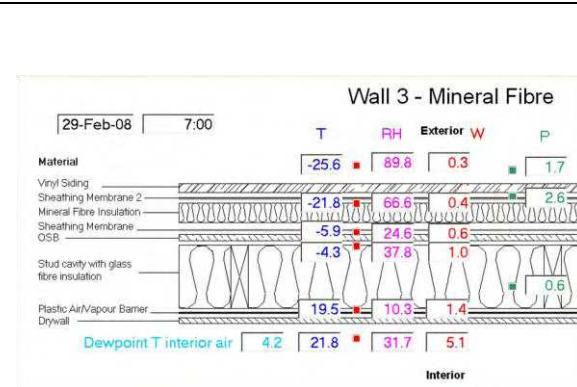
Configuration A2: Snapshot of Wall 3 cross-section (coldest outdoor temperature)
